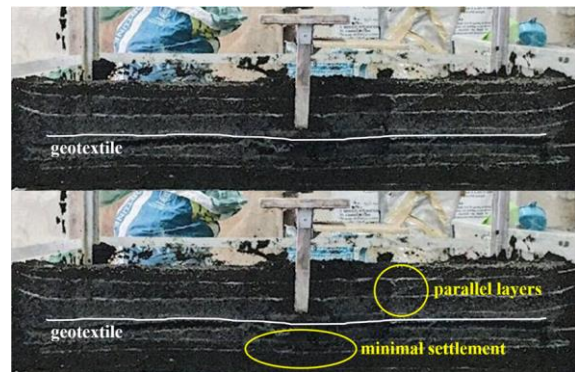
Ground deformation at edge of the column of footing for Sample R1 ($u=0.25B$)
